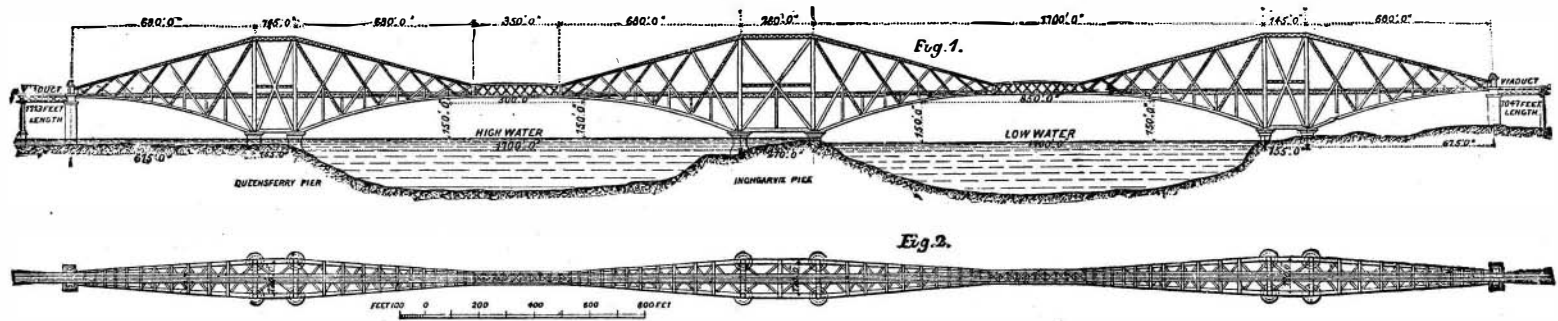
THE FORTH BRIDGE.—ELEVATION AND PLAN.
